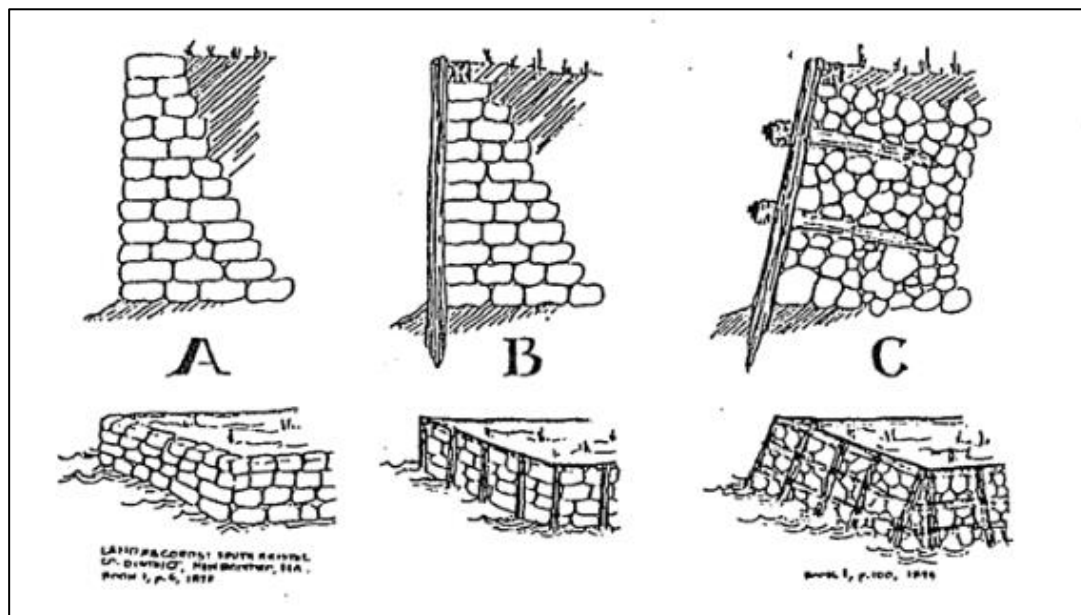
Sketches of stone wharves that exhibit (a) dressed stone (b) semi-dressed stone with fender piles and (c) undressed stone with transverse fenders (Heintzelman 1985:13).
